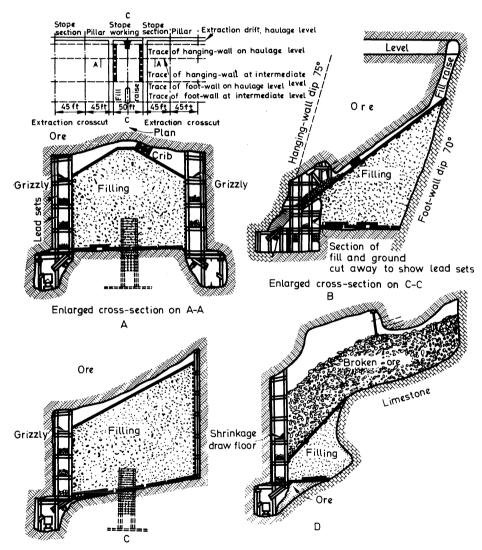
Inclined cut-and-fill stoping system, Campbell Mine, Arizona. (A) Plan and section of double-lead stope. (B) Cross-section on lines C-C of Plan A. (C) Cross-section single-lead stope.
